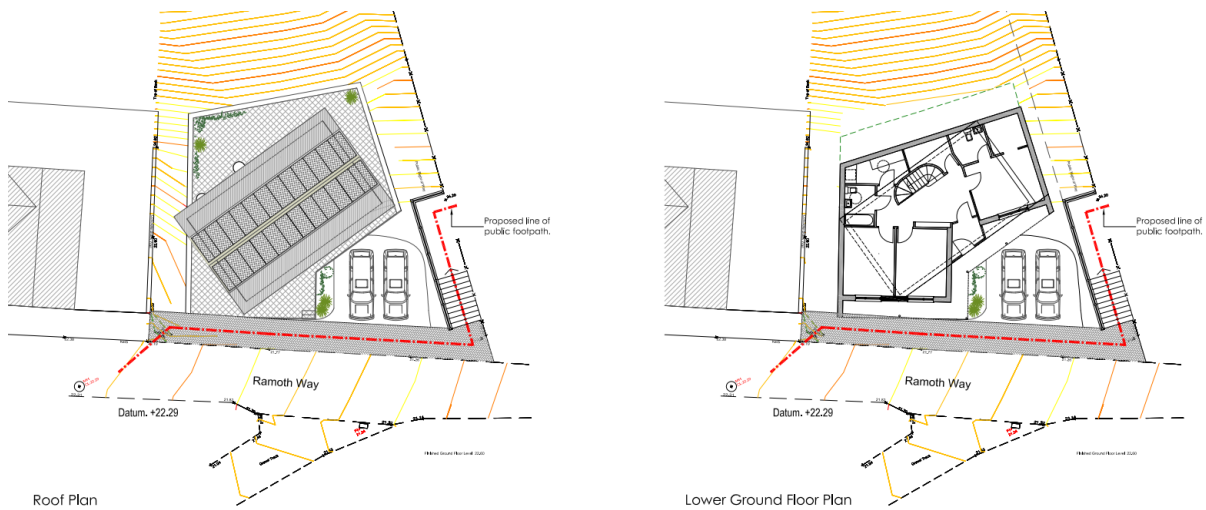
P1223-003 Rev A – Lower Ground Floor and Roof Block Plan
